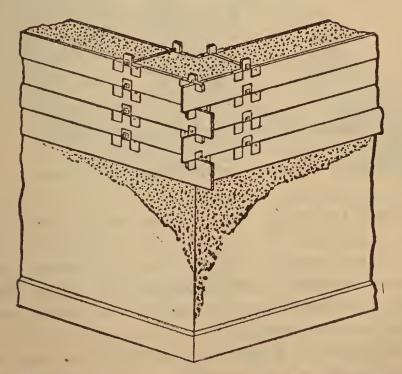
Sullivan Plank-holder as Used for Walls.
